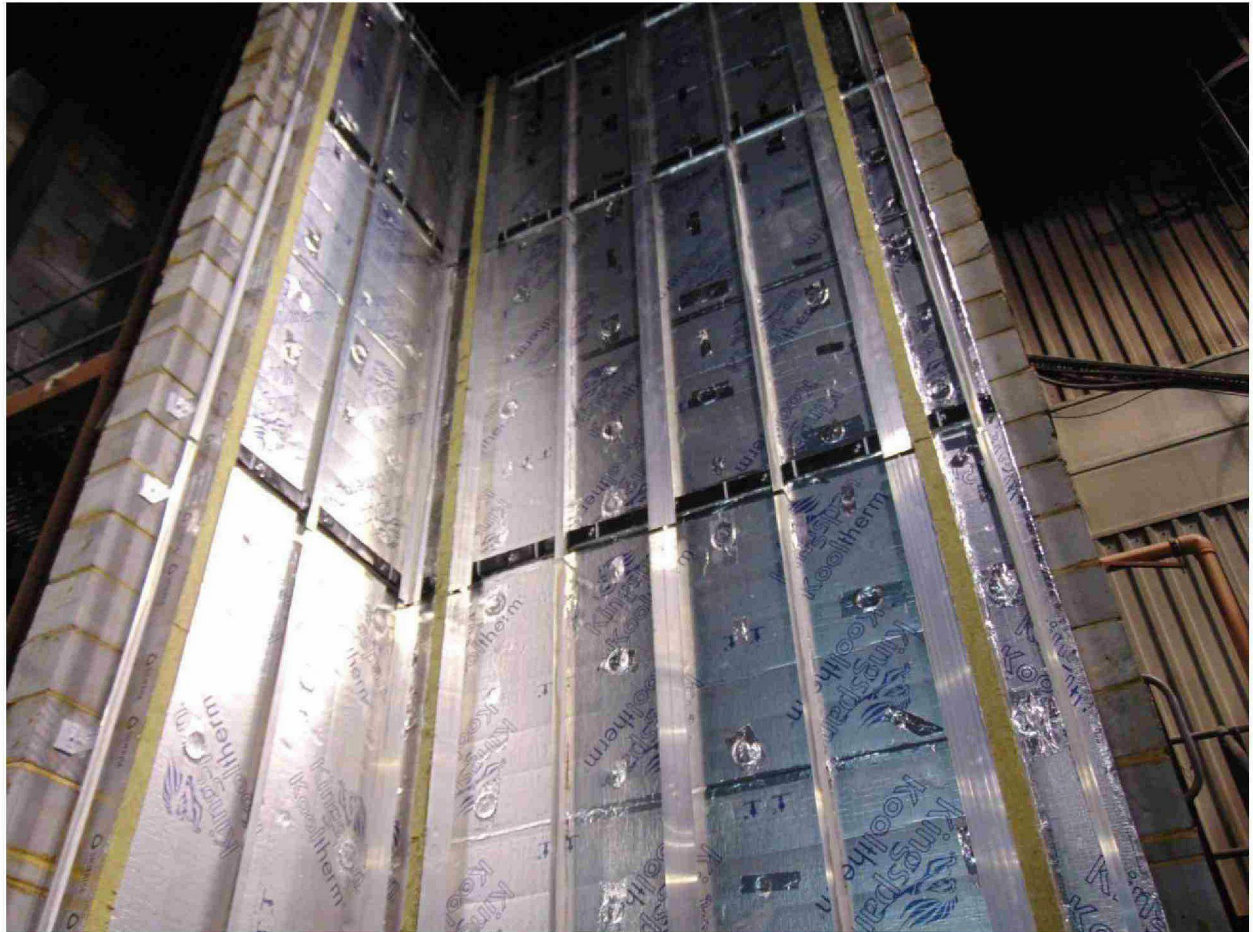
Completed installation of Allface System F1.10 aluminium rail substructure.
